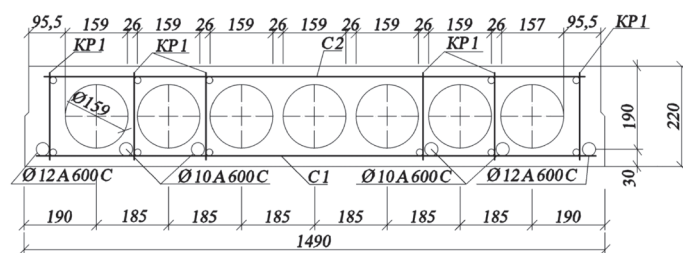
Cross-section of a hollow-core floor slab with a width of 1.5 m
